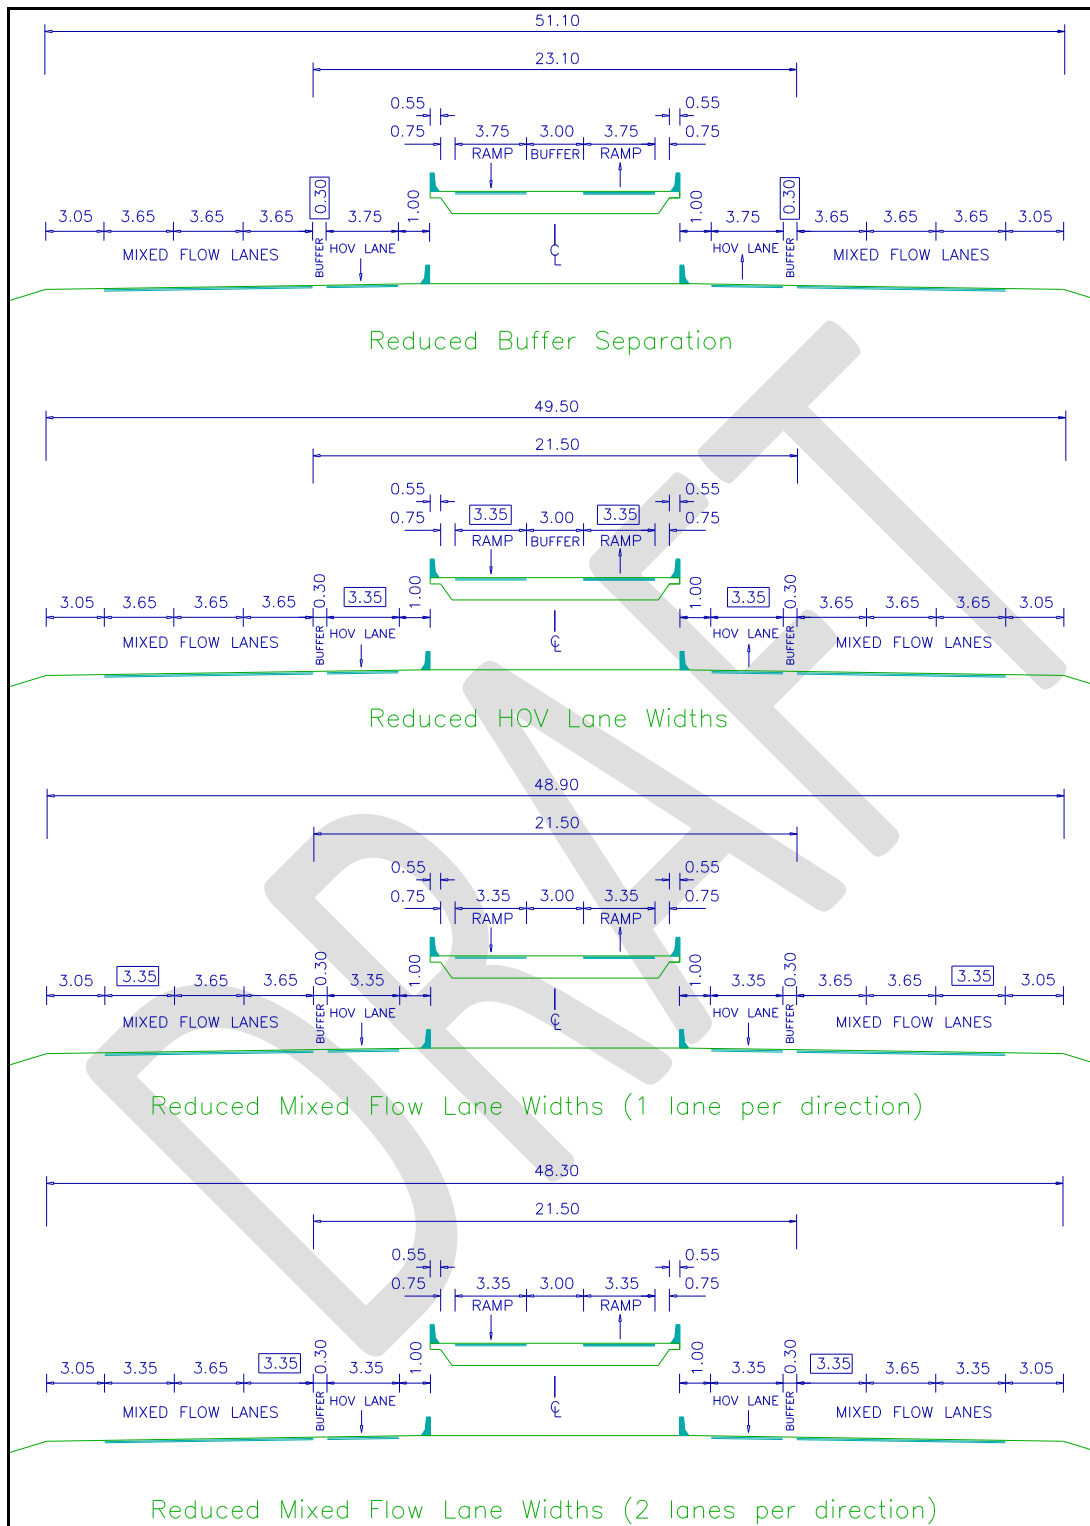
Median HOV Two-Way Ramp Cross-Sections
